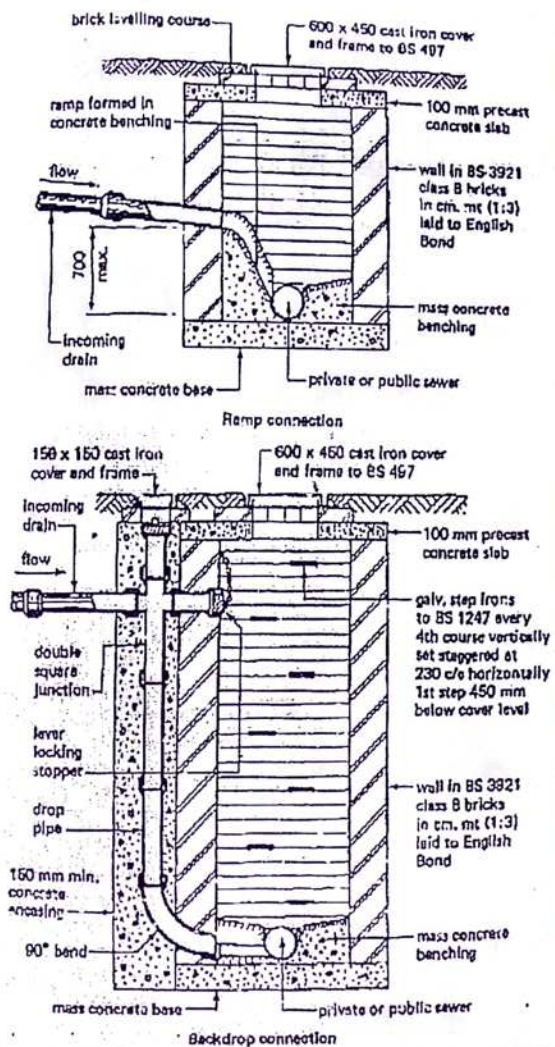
Manhole and inspection chamber sewer connections
